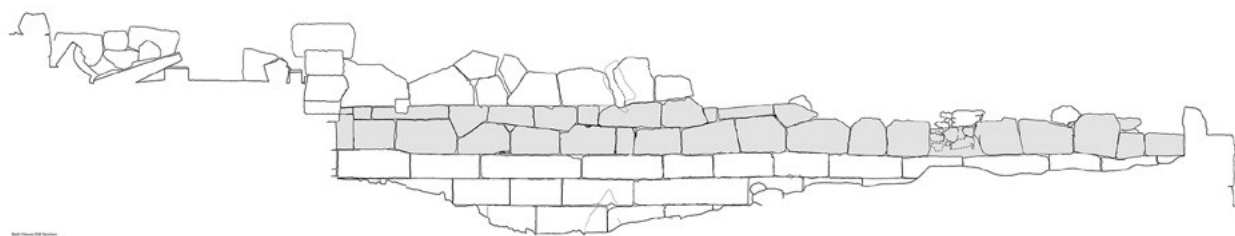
Actual-state drawing of the north wall of the reservoir (as much as is able to be drawn) of the bath facility showing several courses of ashlar masonry below, and two distinct areas of polygonal masonry above (Courtesy of Mount Lykaion Excavation and Survey Project).
